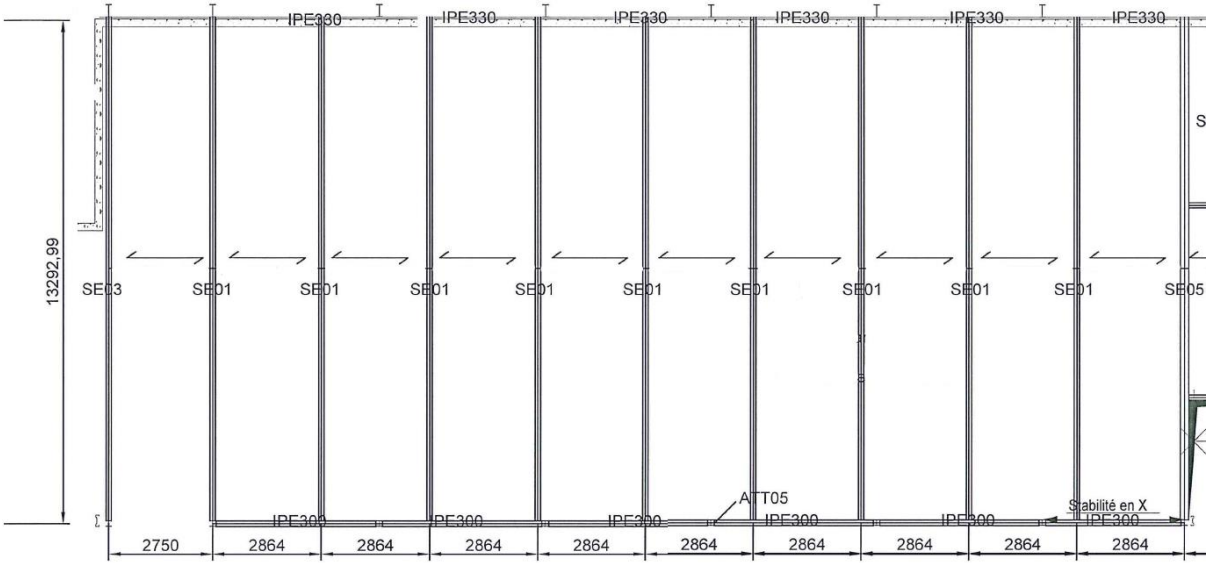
Plan view of the analysed floor (dimensions in mm)
